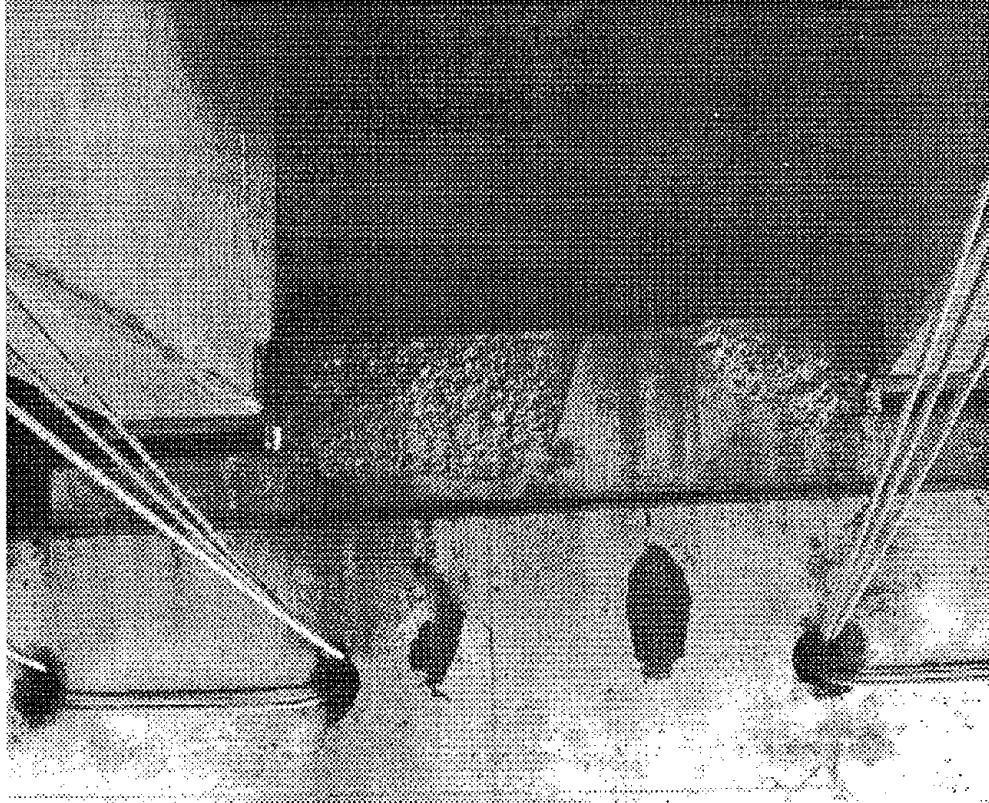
Napa River Bridge Earthquake Damage at Expansion Joint
